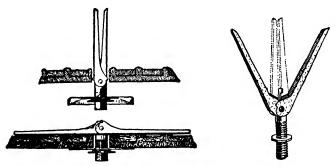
Ceiling Outlet Box and Fixture Hanger Courtesy of the Paine Company, Chicago, Illinois
